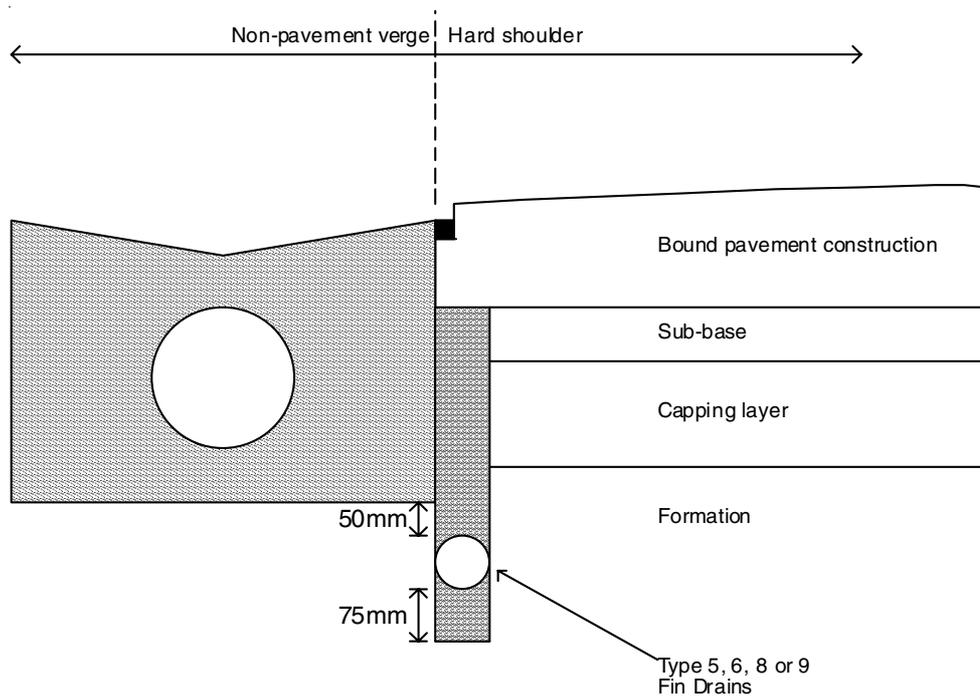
Example of Terminal Outfall - Transverse Cross-section
